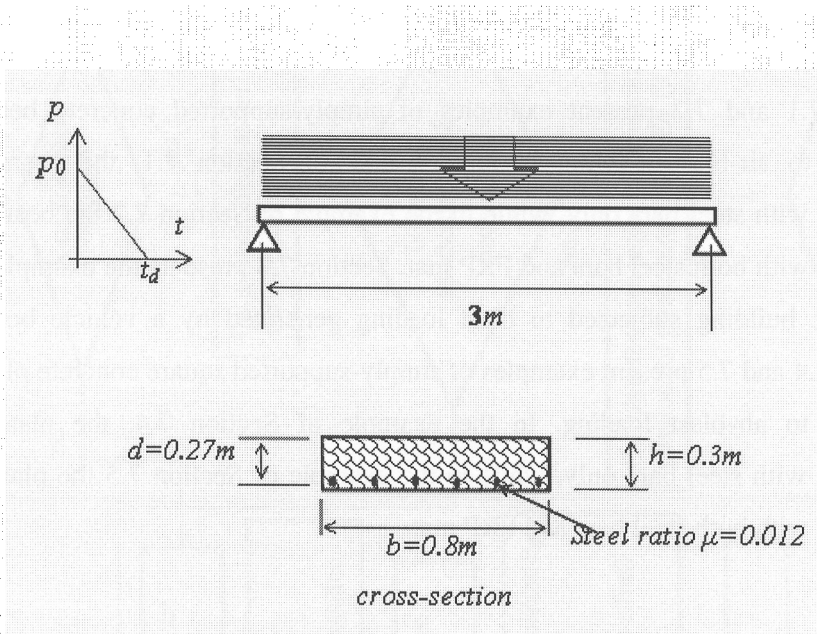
Simply supported RC beam subjected to air-blast loading
